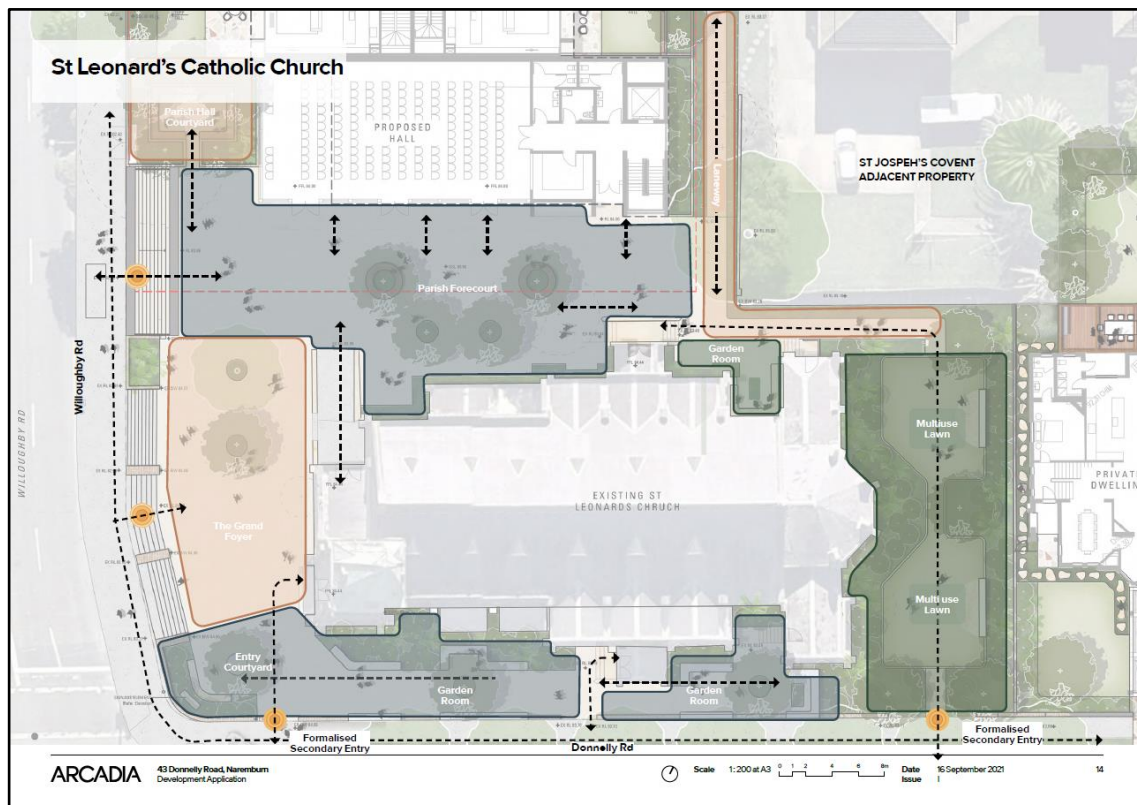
Proposed landscape setting around St Leonard's Catholic Church.
